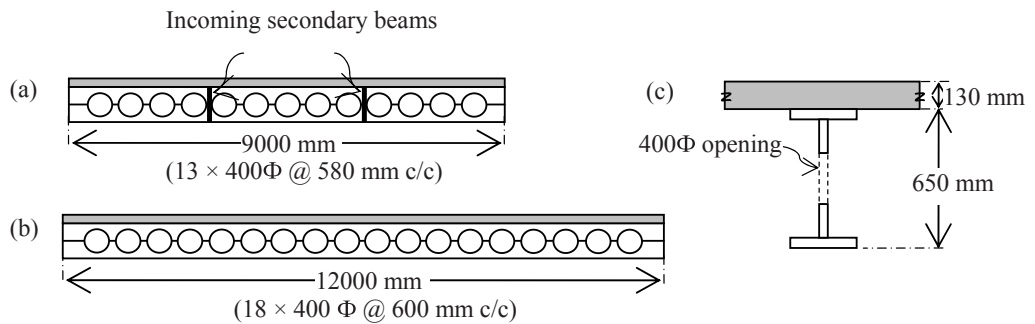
Beam geometries (a) primary beam; (b) secondary beam and (c) typical cross-section.
